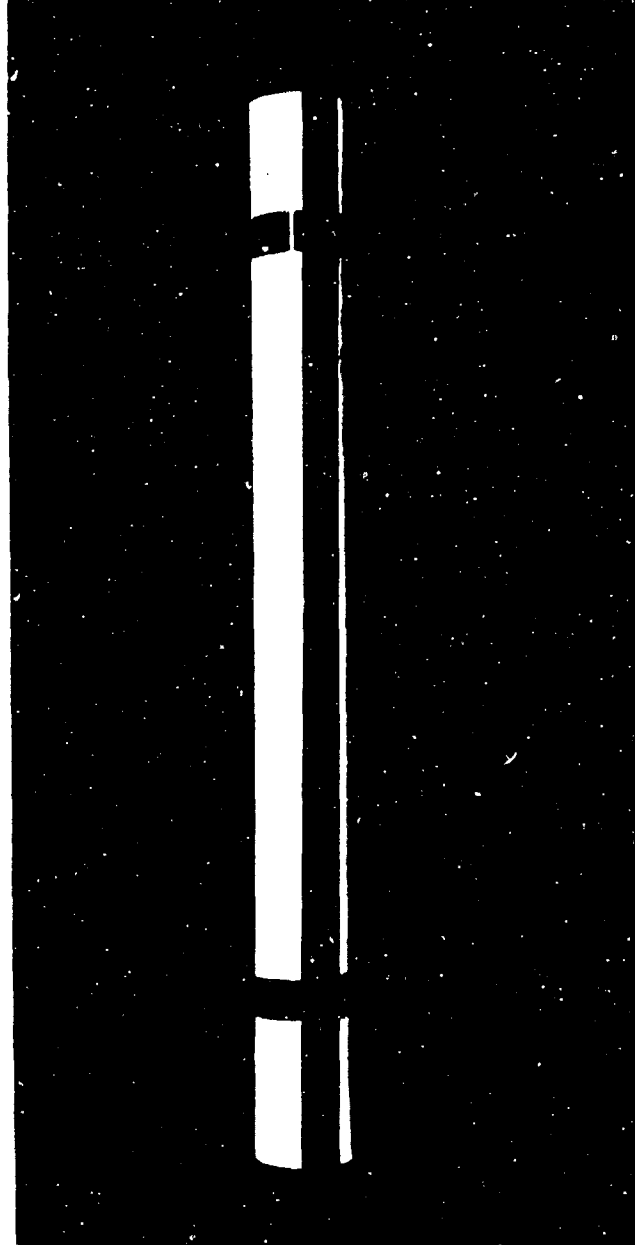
CONCRETE SPECIMEN IN MOLD ILLUSTRATING TAPING
